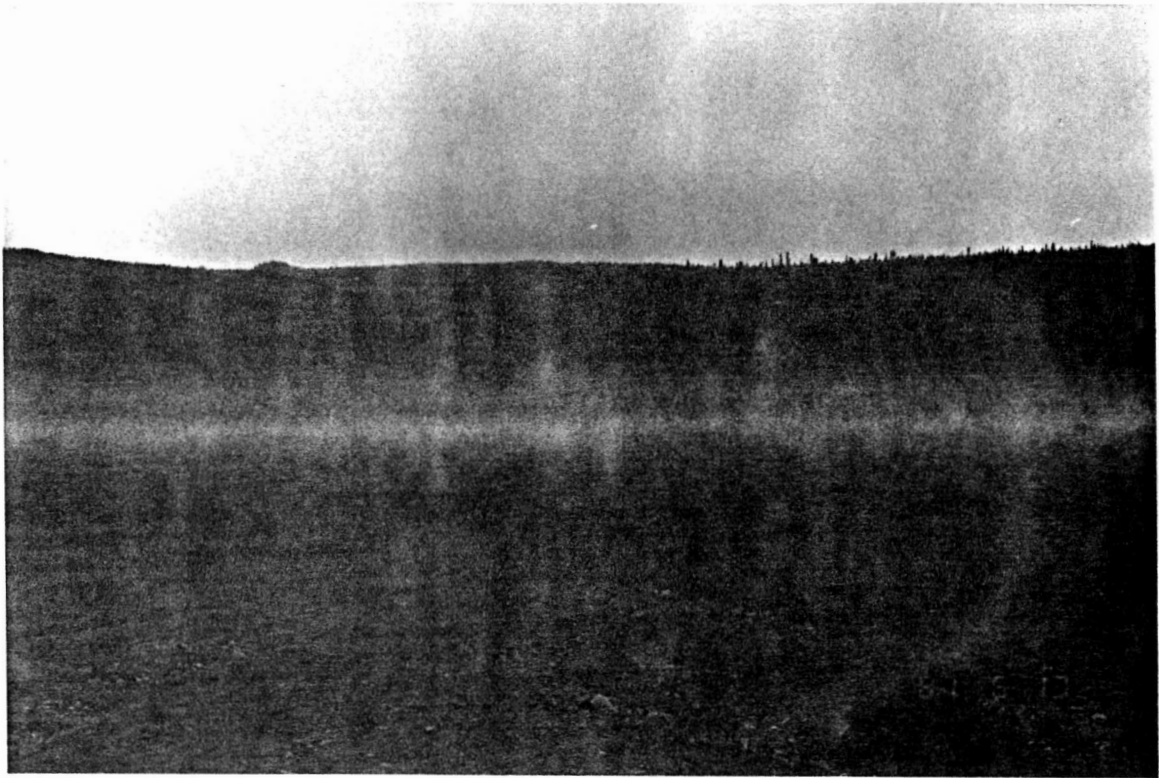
Proposed site of the Vangorda Creek diversion dam.
